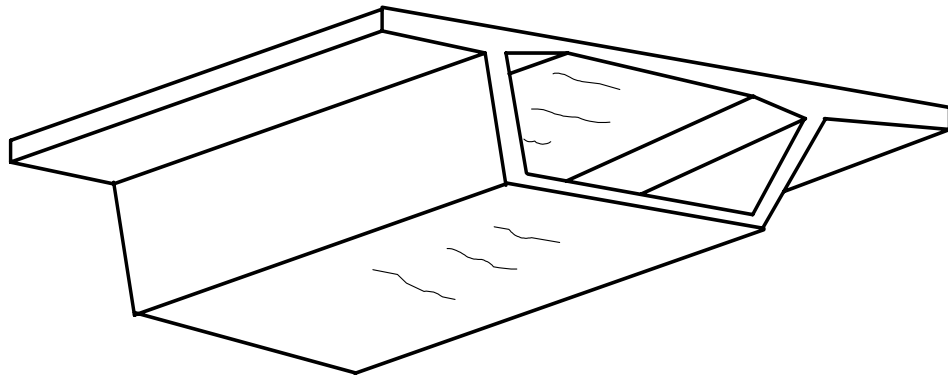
Thermally Induced Cracks in Box Girder Flanges
